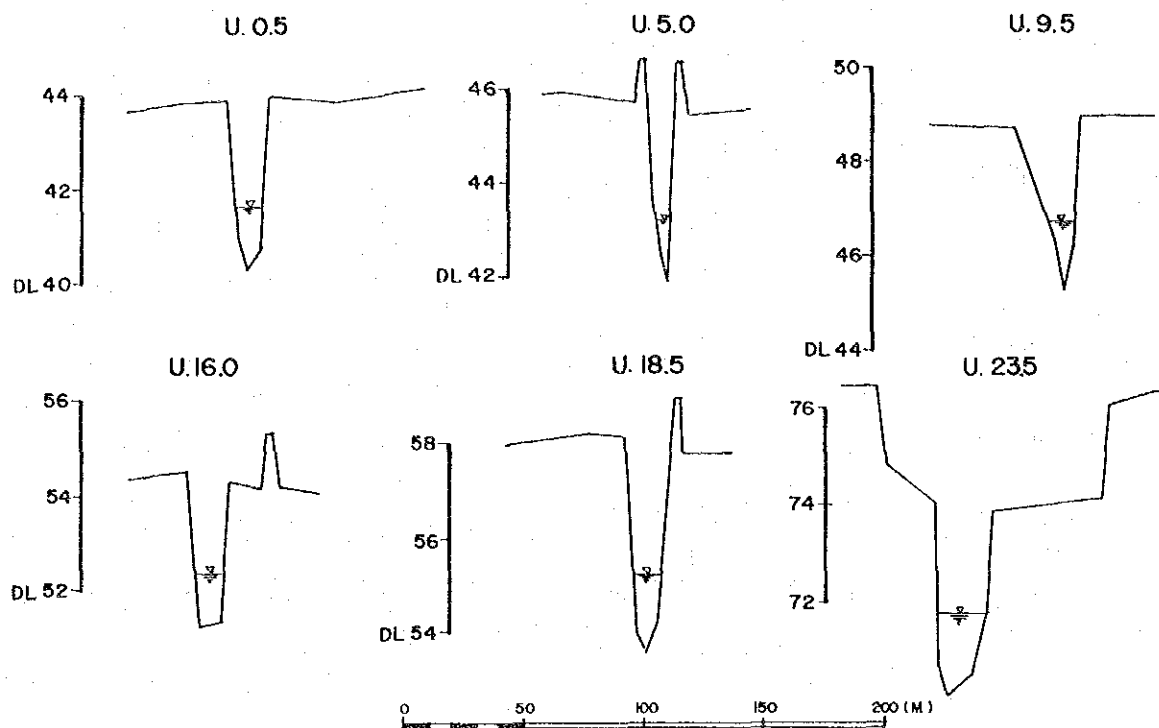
TYPICAL CROSS-SECTIONS OF THE EXISTING K. ULO (4/5)
